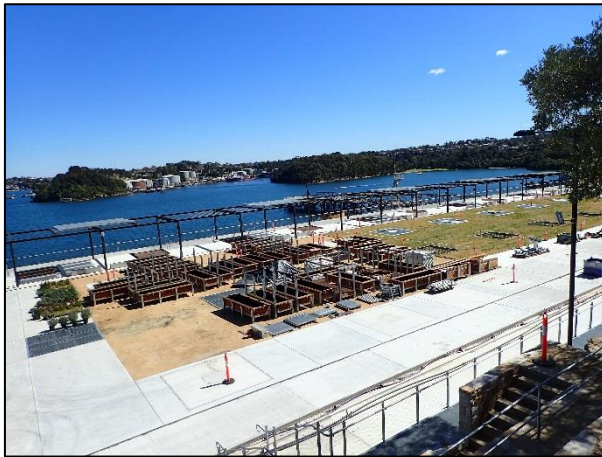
Coal loader platform now being redeveloped as a roof-top garden, facing north-west
